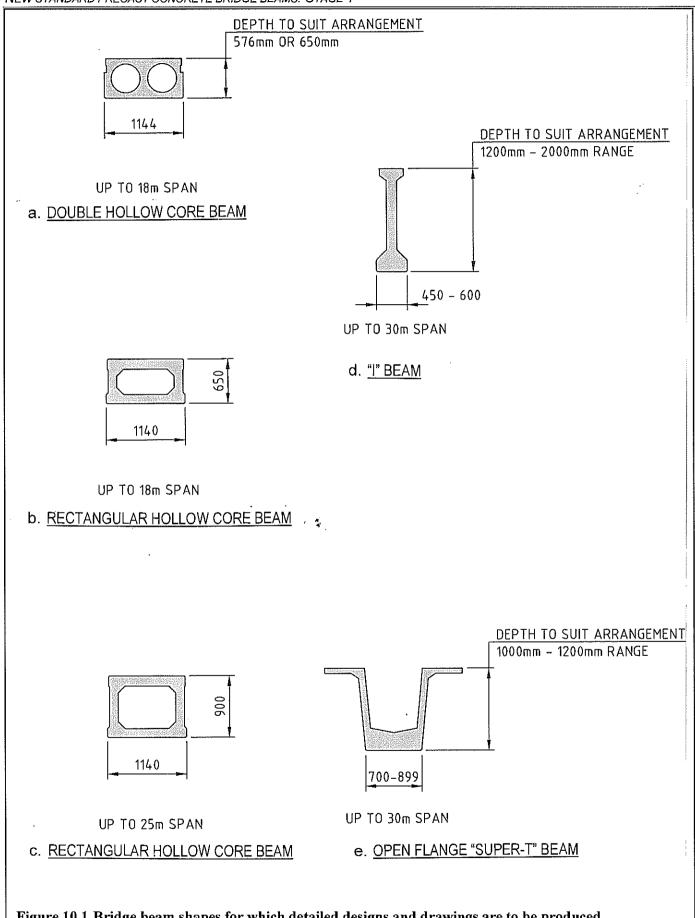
Bridge beam shapes for which detailed designs and drawings are to be produced in Stage 2 of this project.
